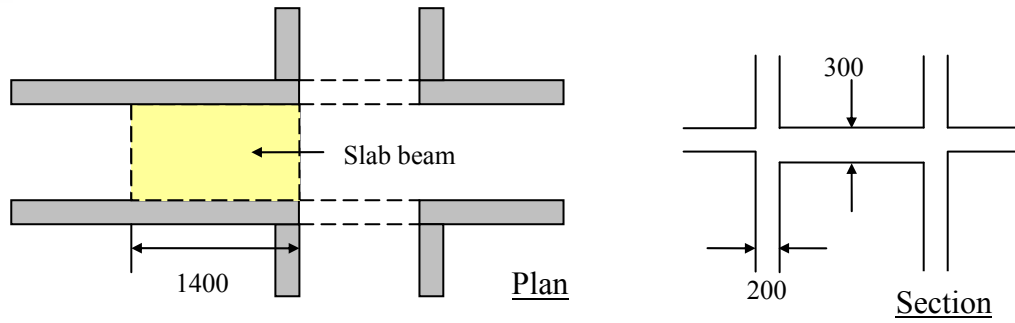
Layout of the slab beam in Worked Example 3.12
